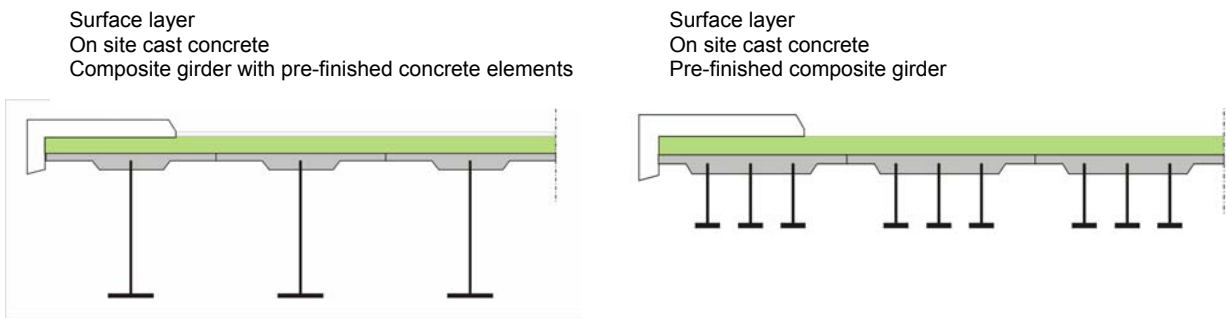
Utilization of pre-finished composite girders with concrete dowels in bridge construction
